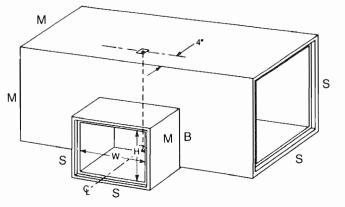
TRUNK DUCT REINFORCEMENT 4" OFF FEMALE SHIPLAP
